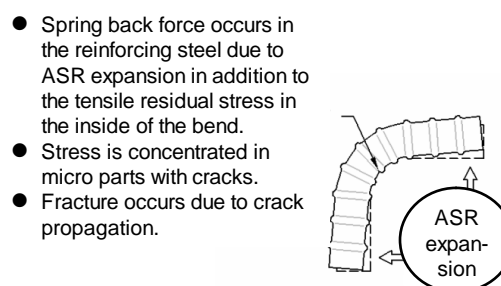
Proposed Mechanism of Reinforcing Steel Fracture
